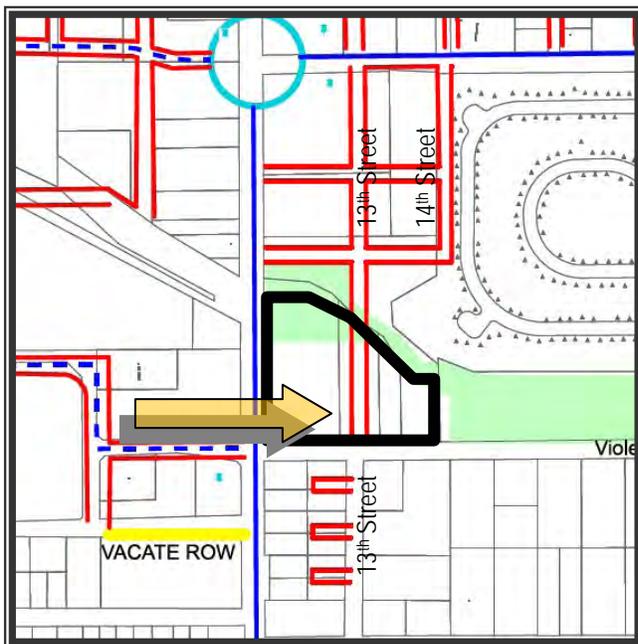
Existing Right-of-Way Plan For Vehicular Access for 13th Street
